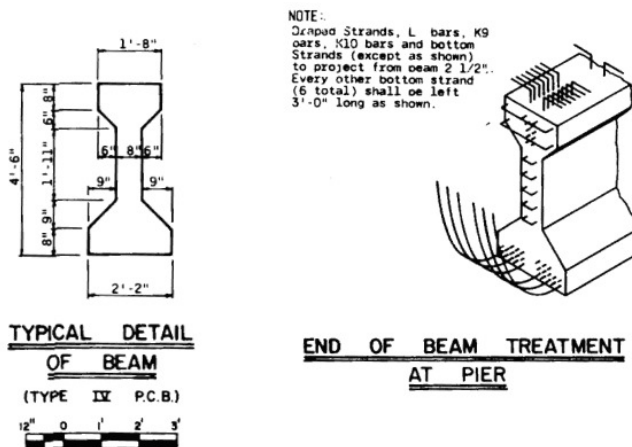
Example PC bridge girder sections (reprinted with permission from USACE). Extended prestressing strands at end of beam shown.
